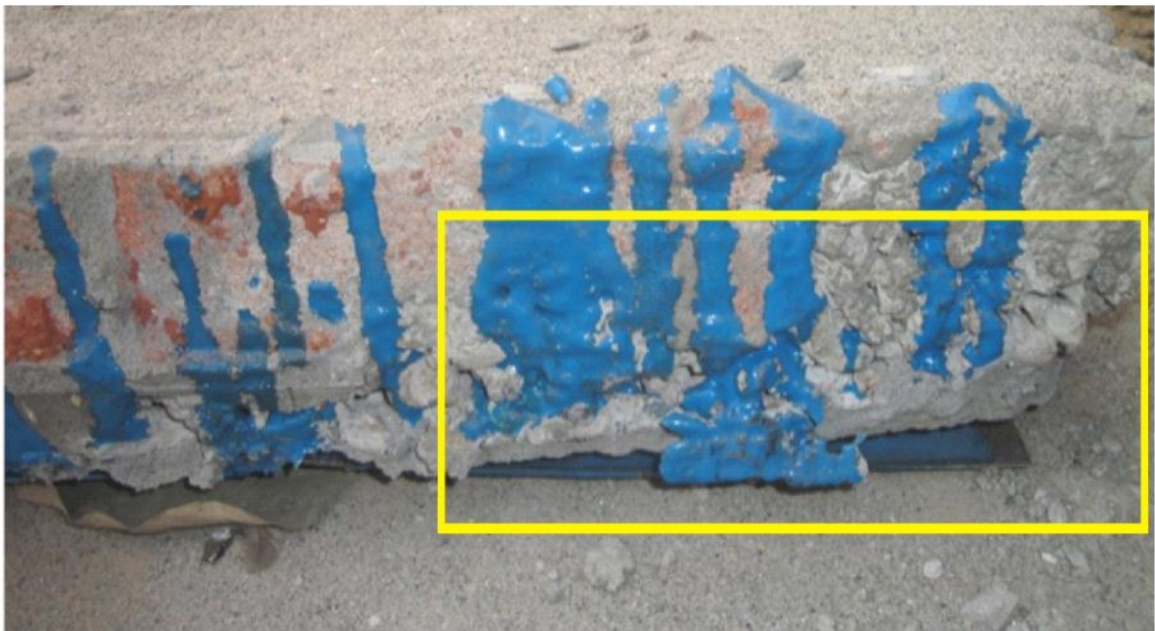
Failure pattern of slab retrofitted with Ferrocement (typical)
